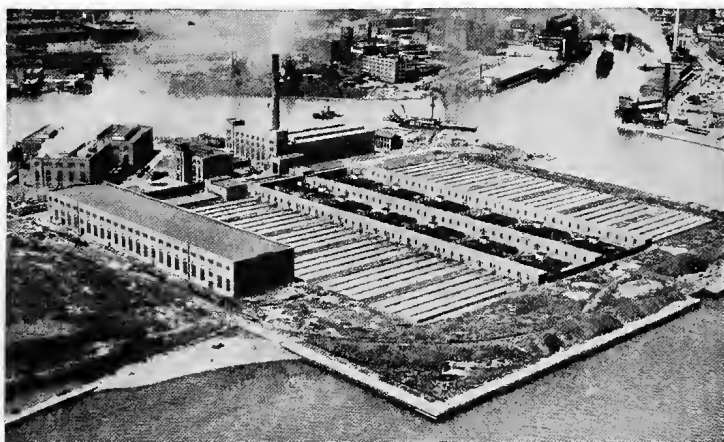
Activated-sludge plant at Milwaukee, Wis. (*Chicago Aerial Survey Co.*)
